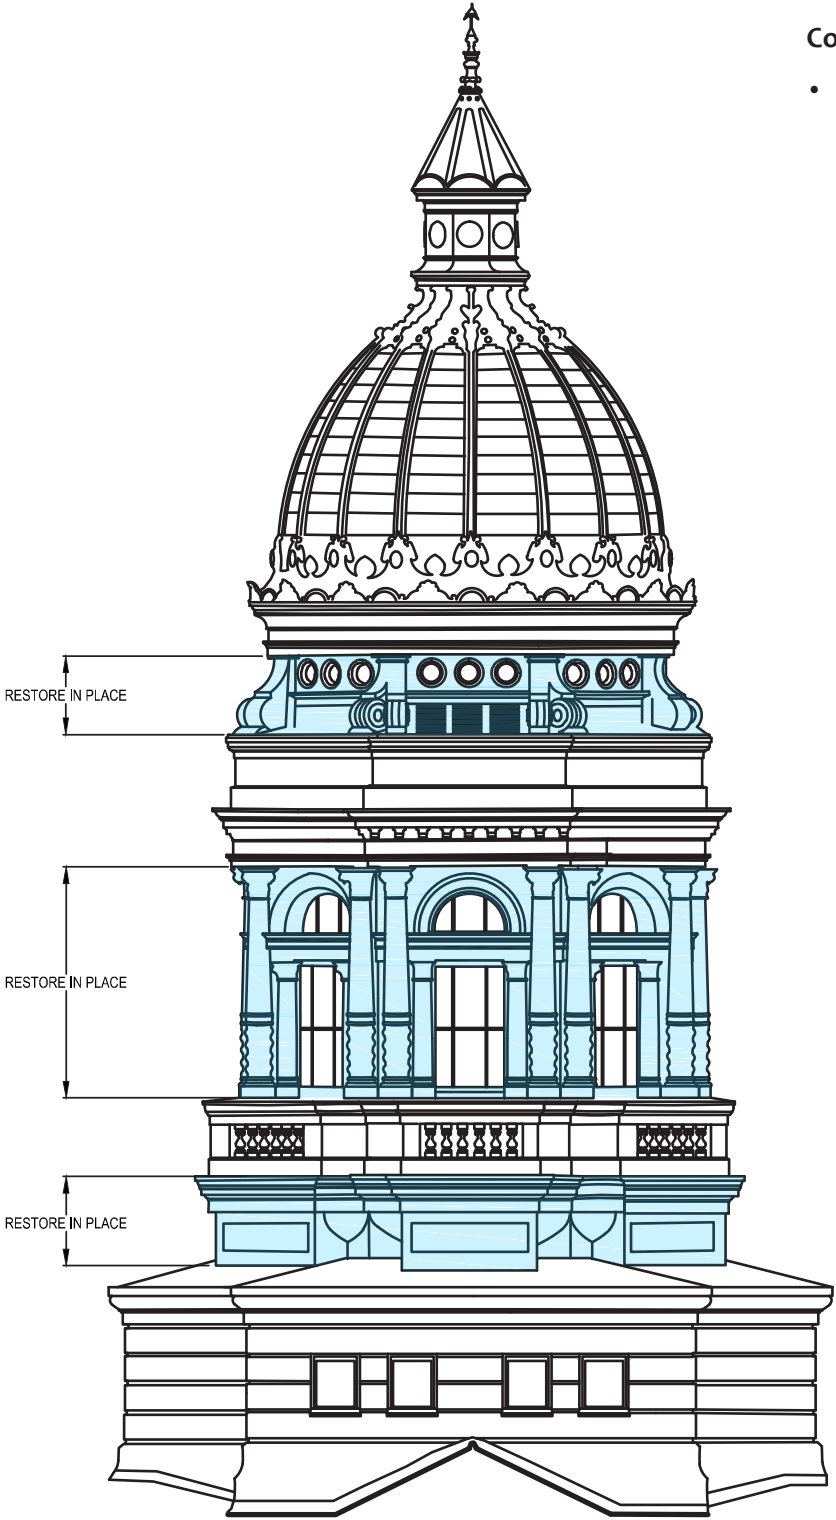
Key Elevation Indicating Galvanized Metal to be Disassembled and Restored in Place
